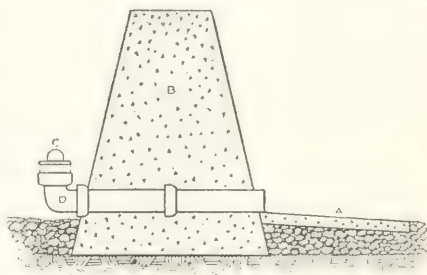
Cross section of a dam showing drain made of sewer pipe. A, apron; B, dam; C, wooden plug; D, sewer pipe
